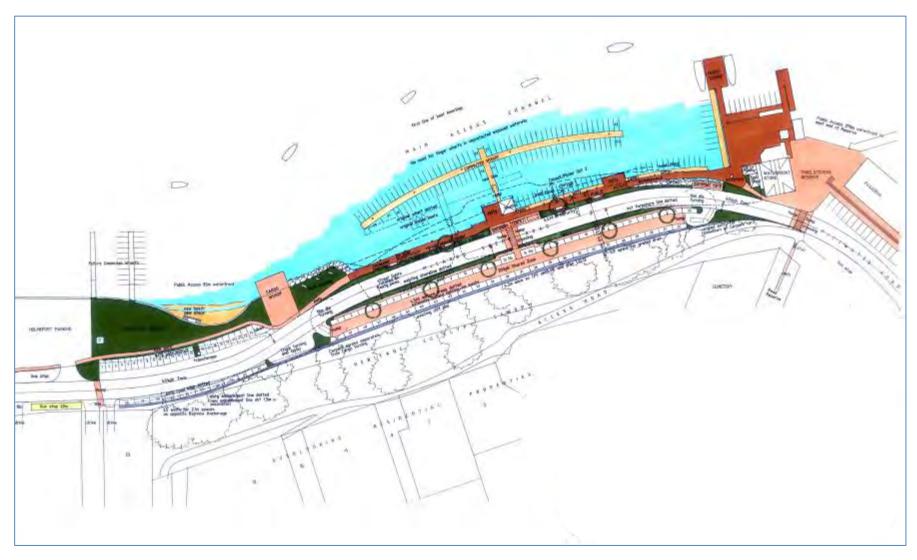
Option 3 – Minimum infill with 37 space car park
